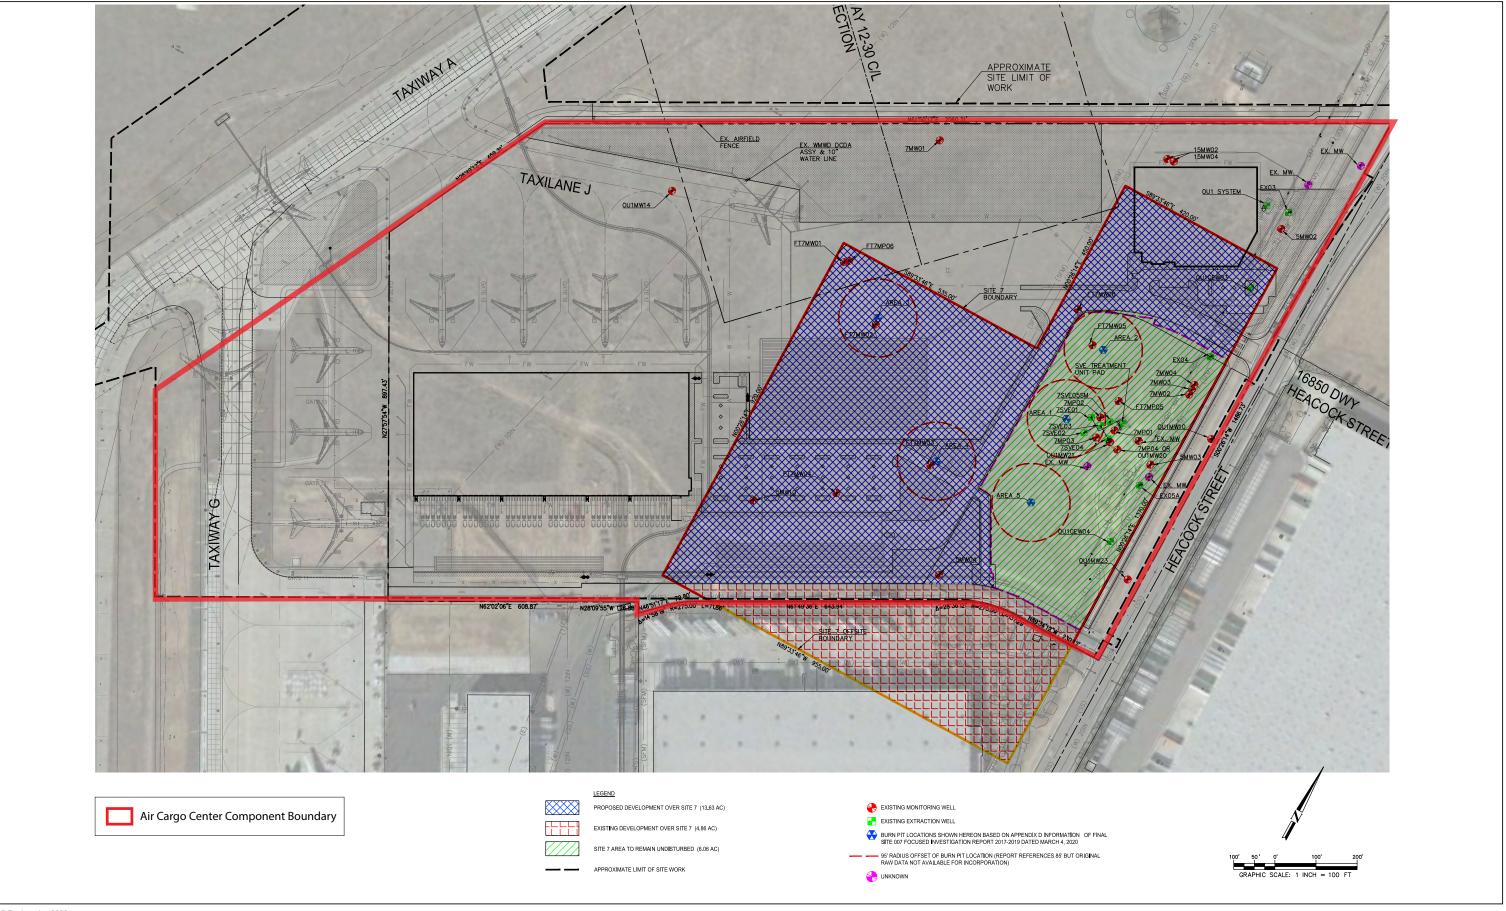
Site Plan: Air Cargo Center Component Meridian Park D-1 Gateway Aviation Project
